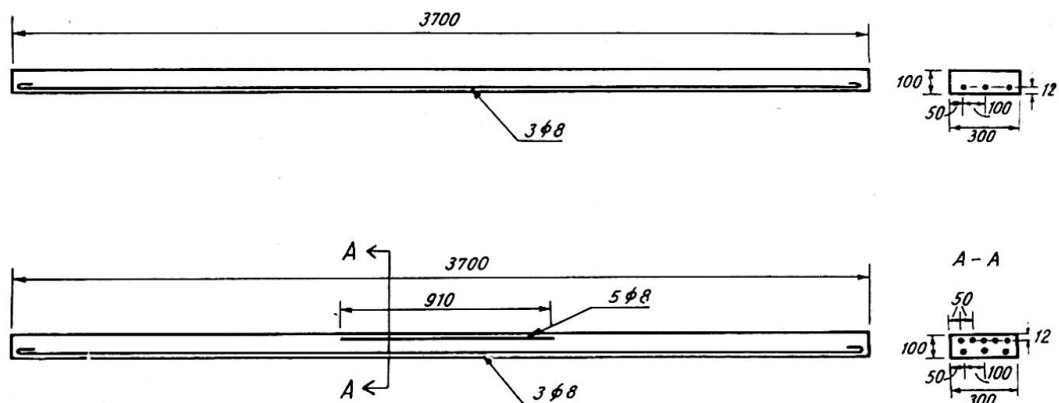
Dimensions and reinforcement of the beam specimens used in the shrinkage tests
